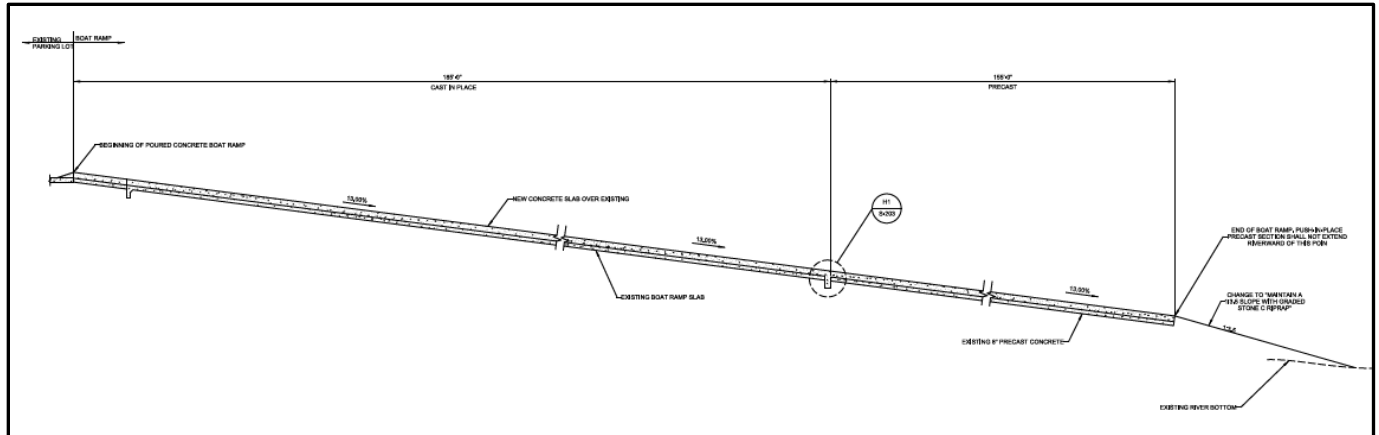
Proposed boat ramp repair profile, New Madrid County, Missouri.
